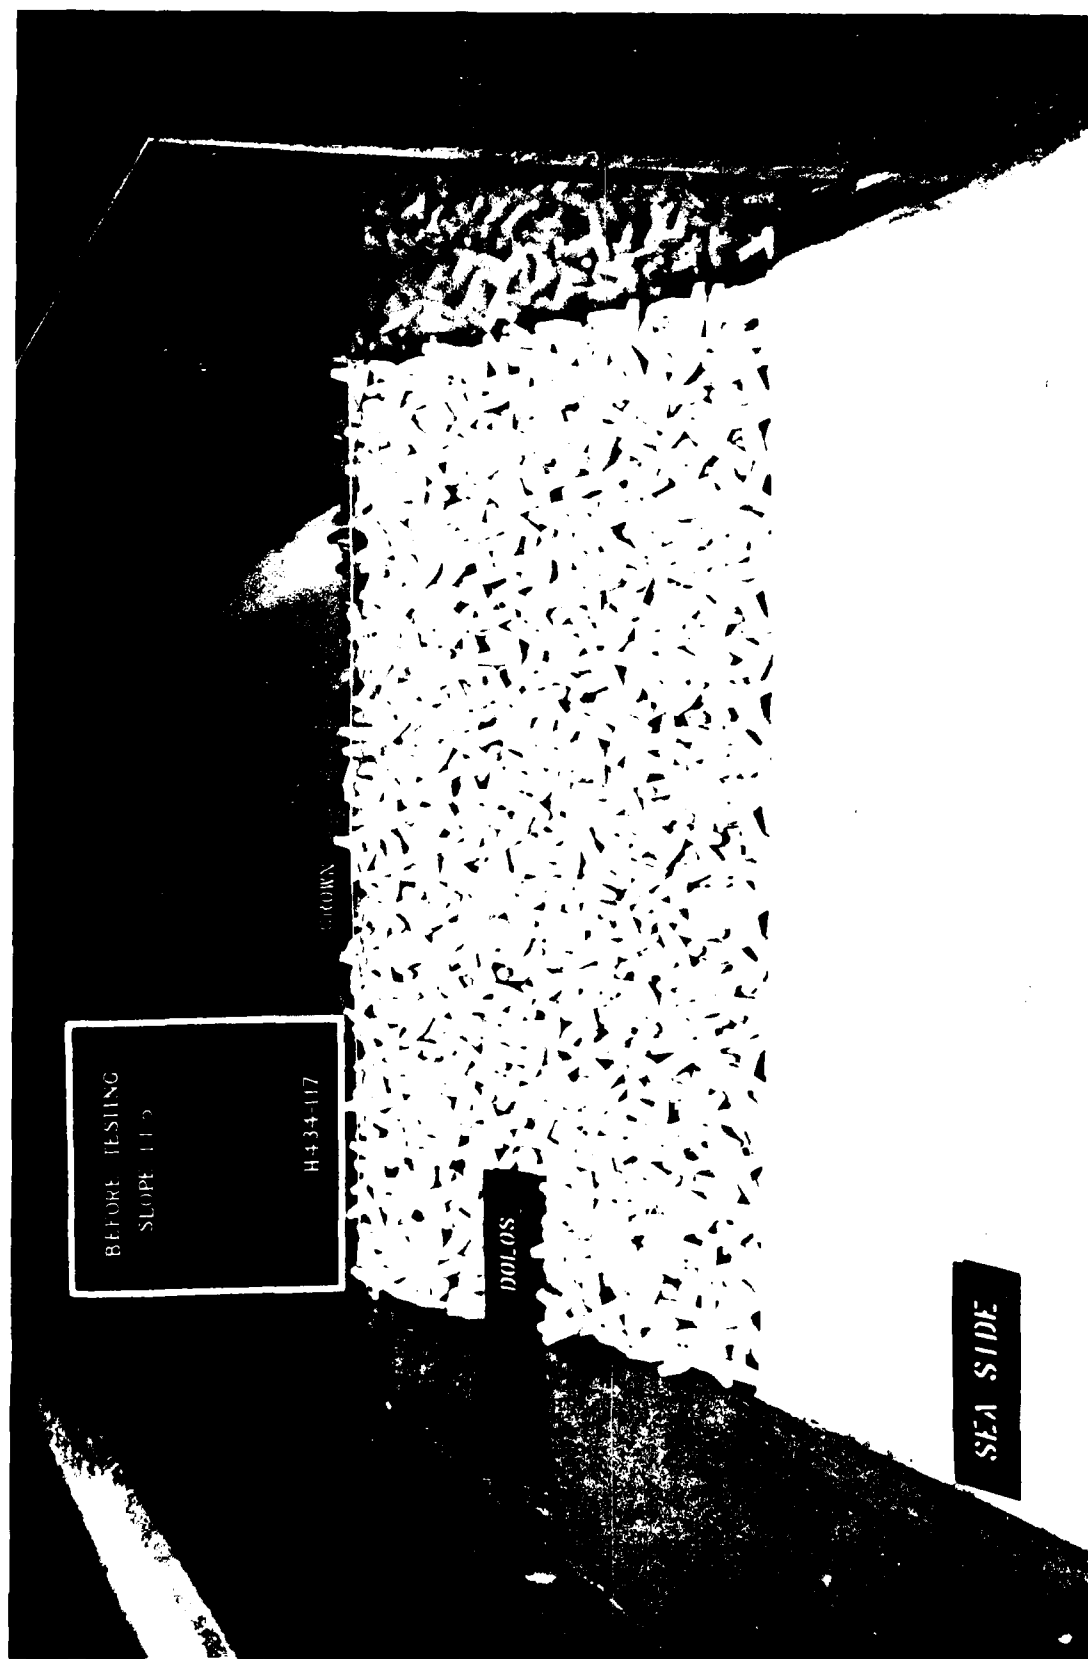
Sea-side view of a typical dolos section before wave attack at a LV-on-1.5H sea-side structure slope;  $W_a = 0.276 \text{ lb}$
